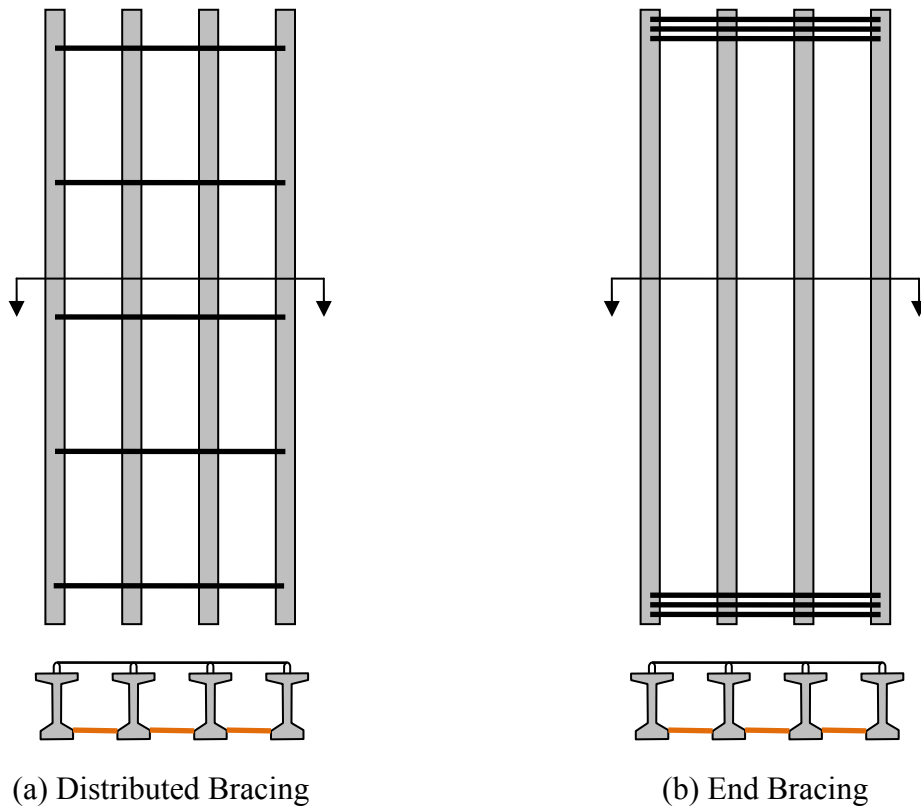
Plan View of Girder Systems with Distributed and End Bracings
